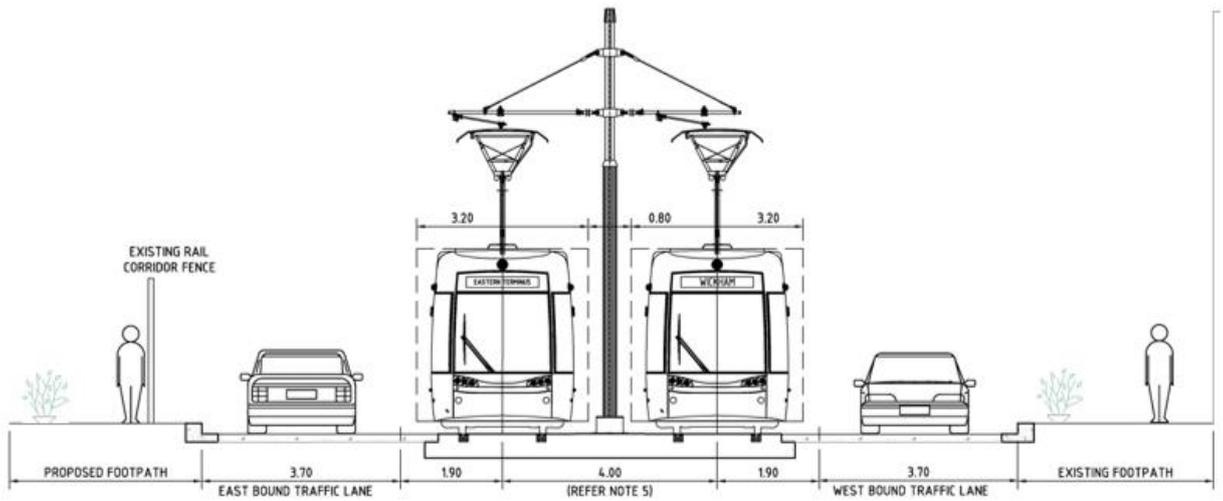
Typical cross section along Hunter Street – at Crown Street
